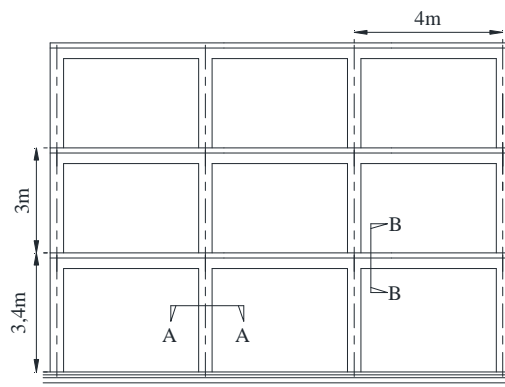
Elevation of the RC frame that is used as a reference structure.
